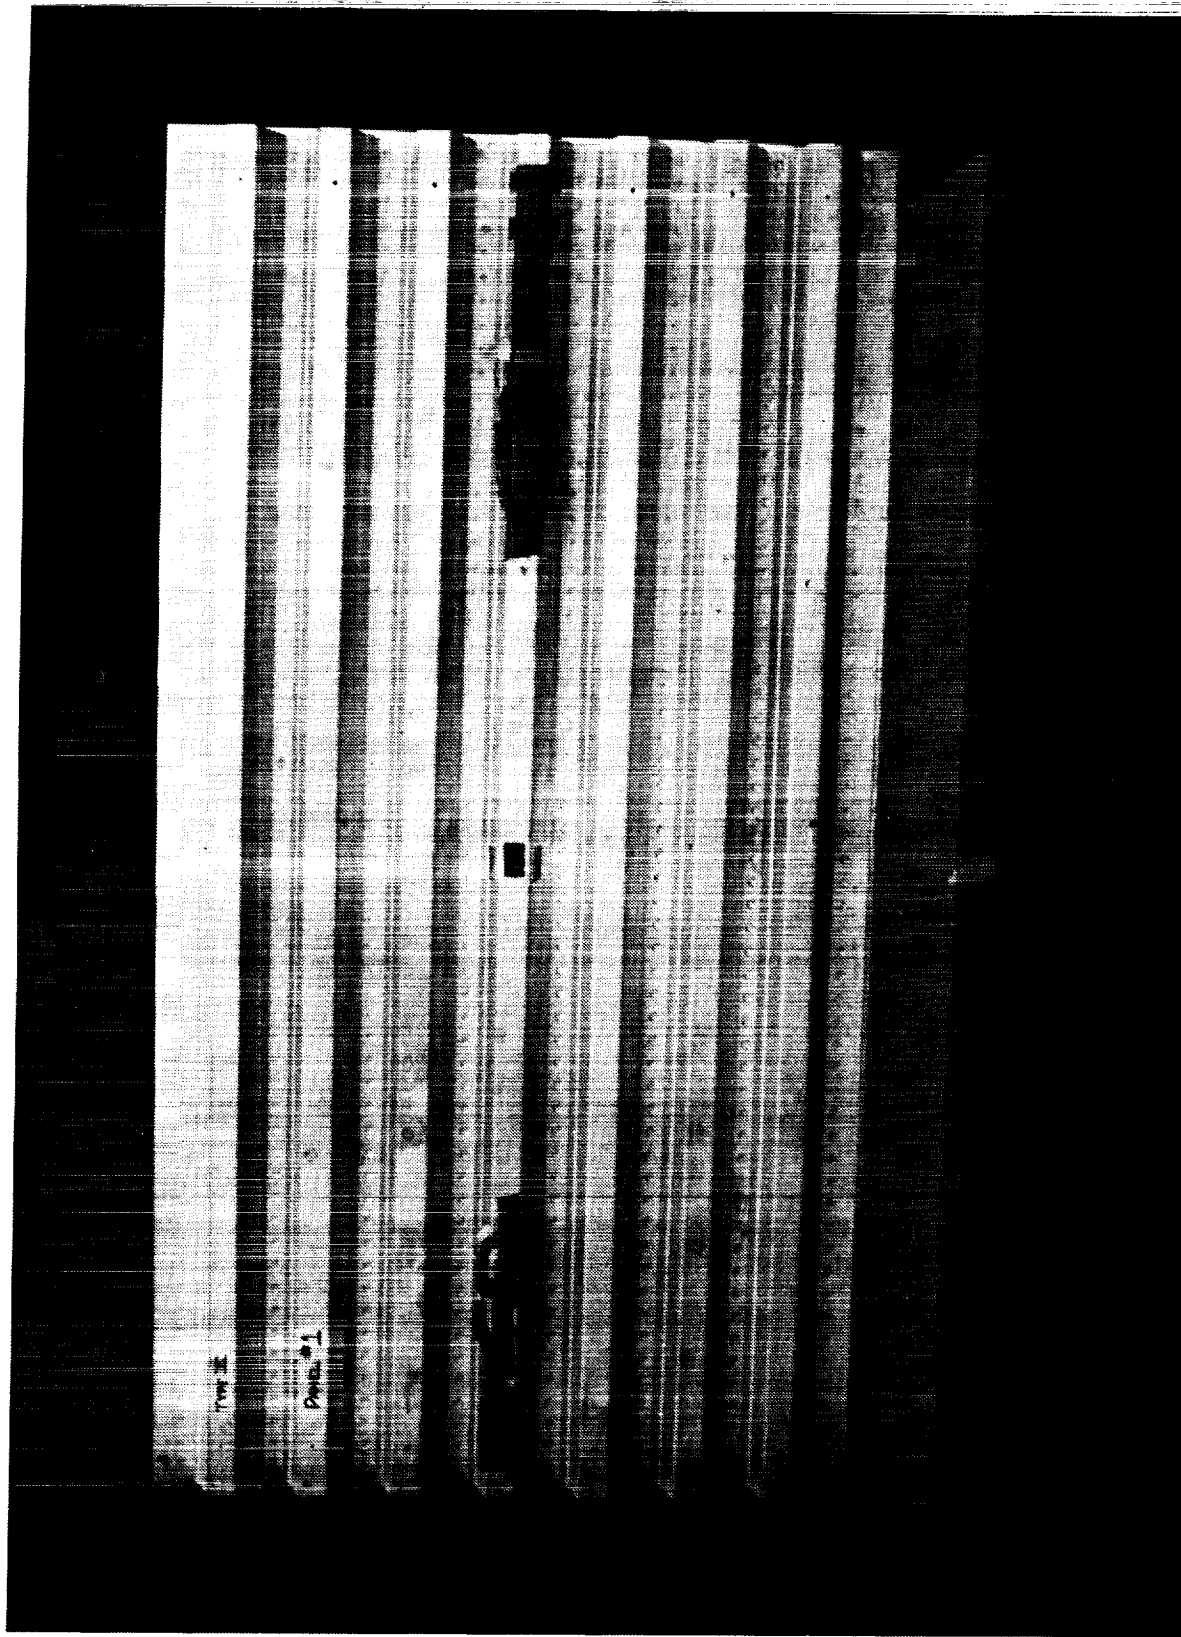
Welded Column Buckling Panel (Front View).
